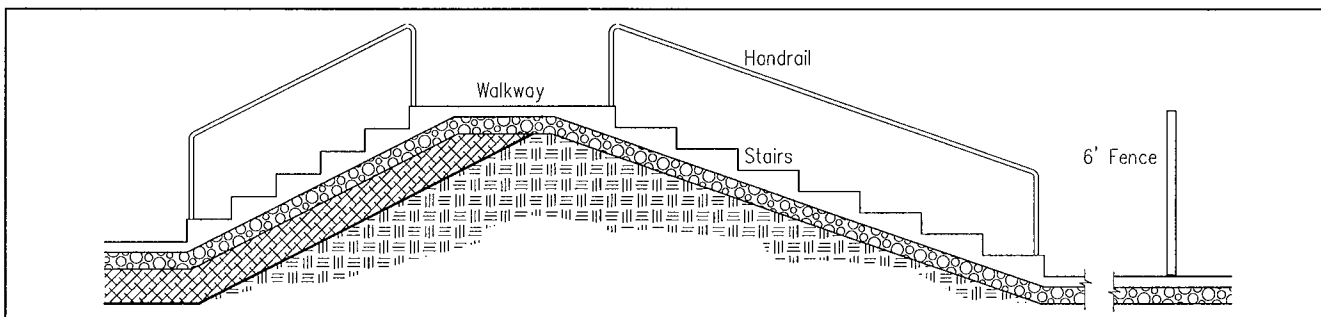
Walkways and stairs to protect workers and earthen dikes.
